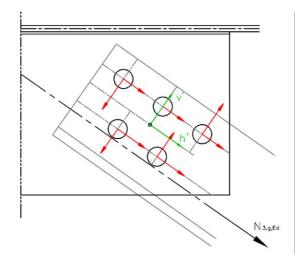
Loading on bolts (forces in the {h', v'} system) - regarding the gusset
